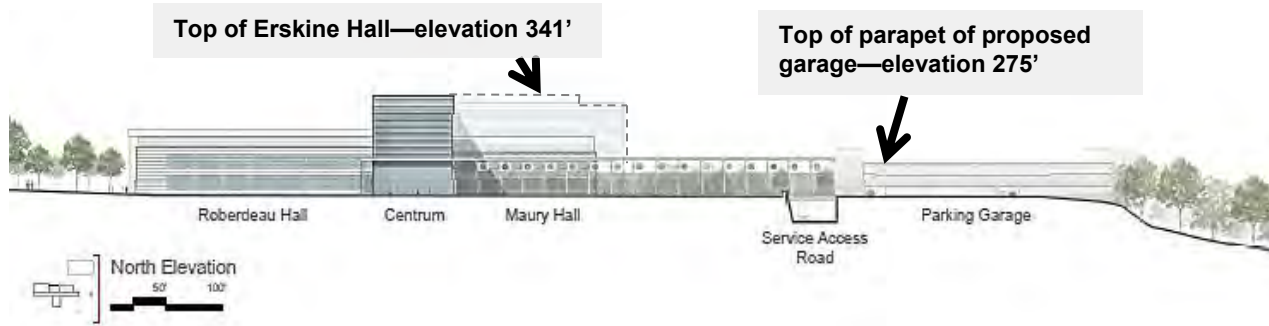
North elevation of early concept design. While the horizontal location of the garage is now modified from the early concept design illustrated above, the vertical relationship (heights) of the proposed garage to the existing structures essentially stays the same as the illustration shows. Following redevelopment, the top of Erskine Hall will remain at 341 feet above sea level and the top of Maury Hall will remain at 297 feet above sea level. The top of the garage parapet is proposed to be 275 feet above sea level.
